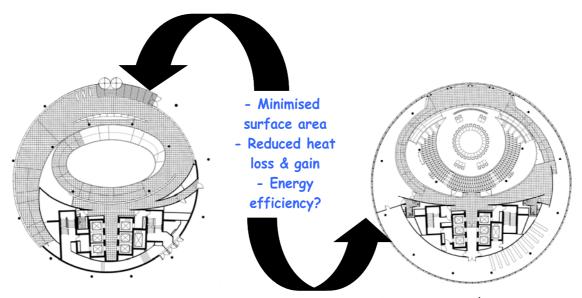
GLA Building's Ground floor plan (Image source: © Foster and Partners)
